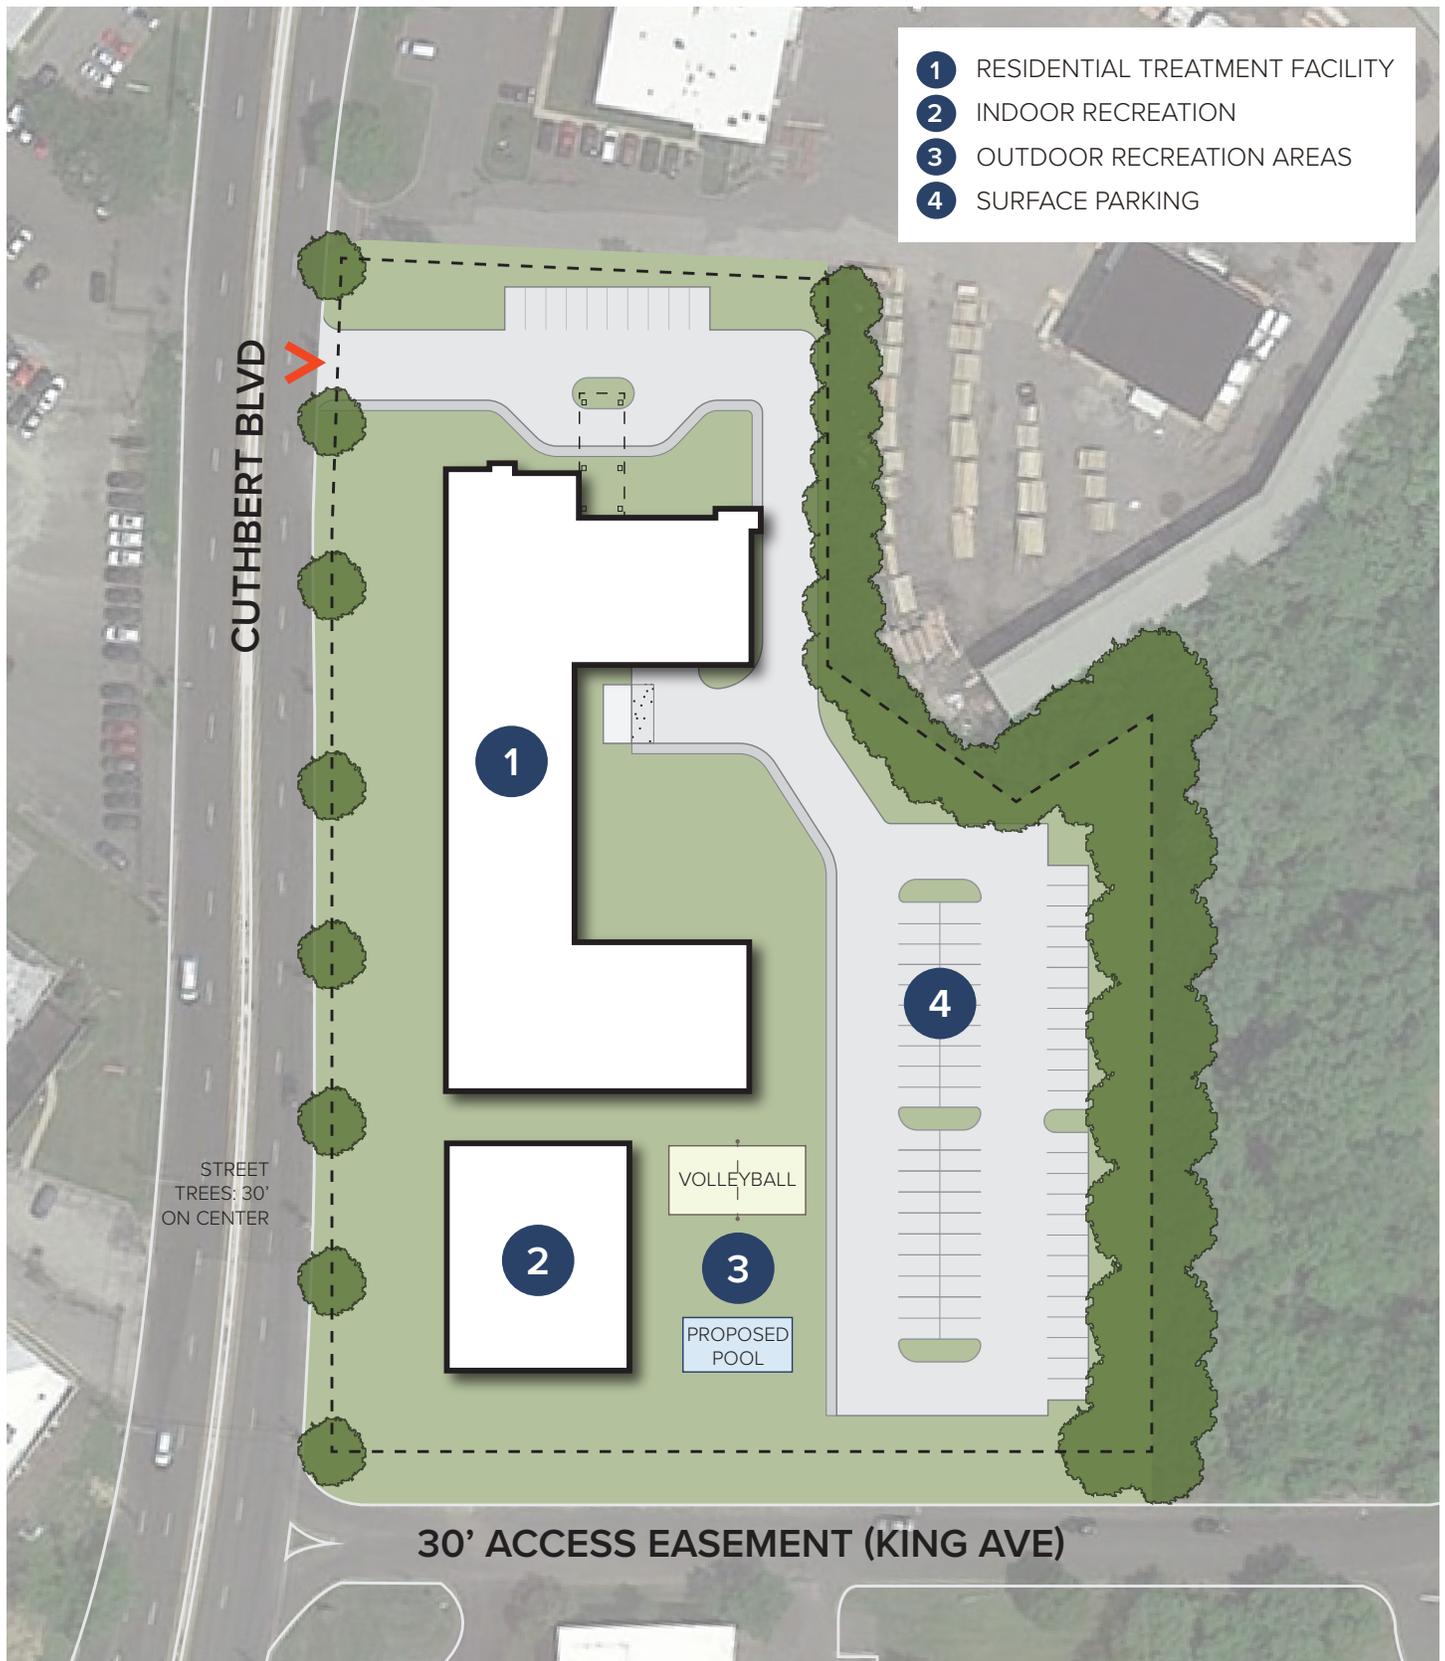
Redevelopment Site Conceptual Plan - Option 2
